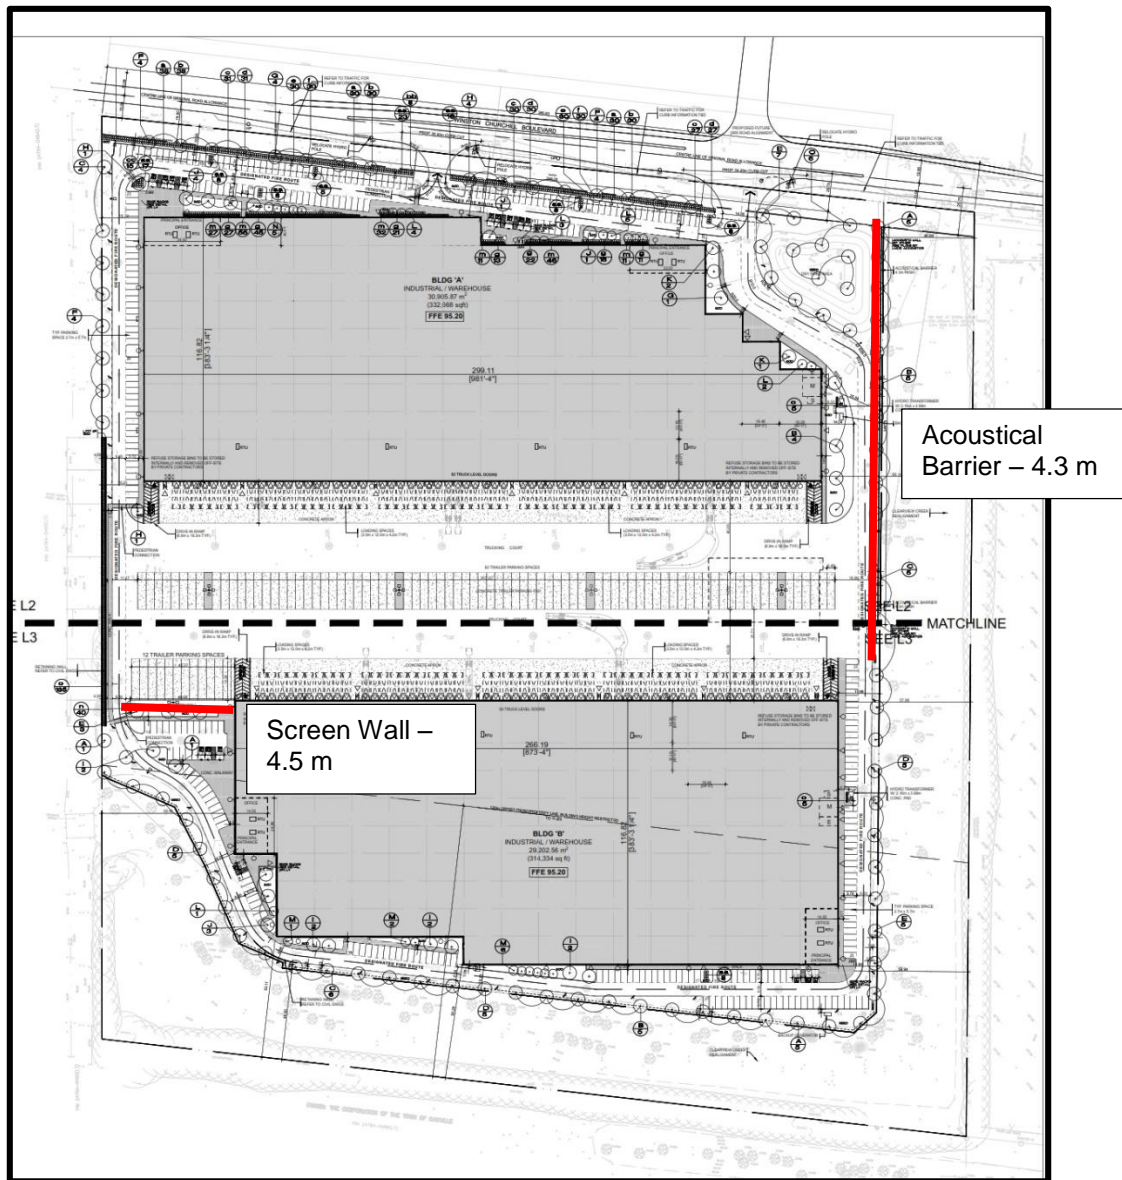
Landscape Plan 700/750 Winston Churchill Blvd.
